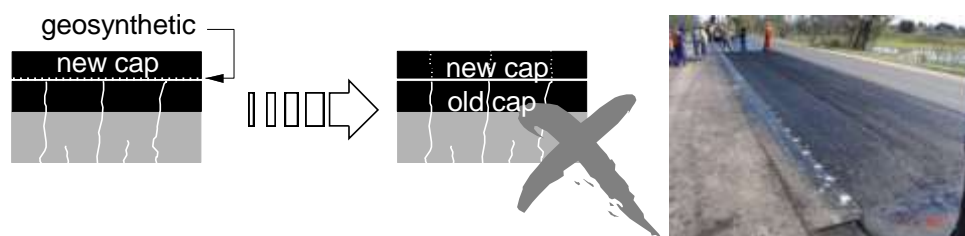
Geogrids to avoid reflective cracking in pavements (Palmeira 2007).
